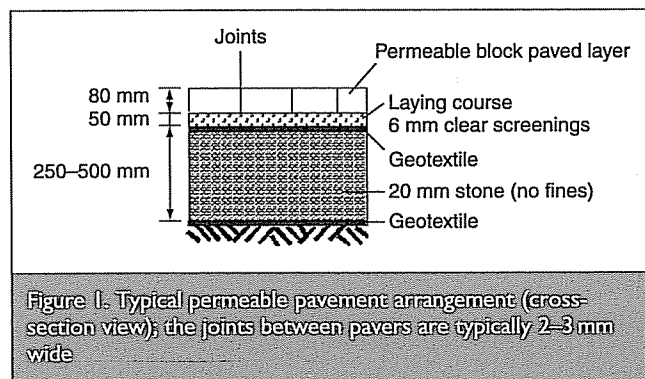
Typical permeable pavement arrangement (cross-section view); the joints between pavers are typically 2-3 mm wide
